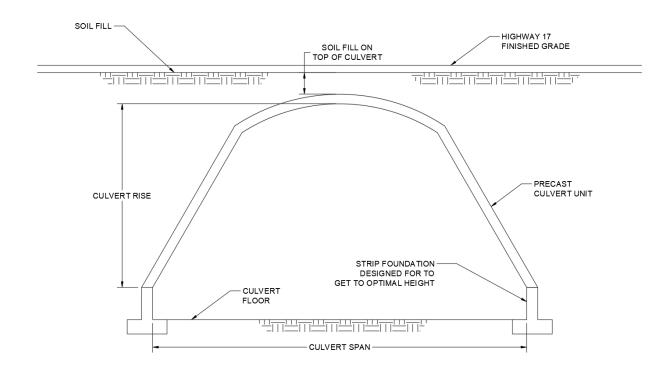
Critical dimensions for the precast concrete culvert to be determined.
